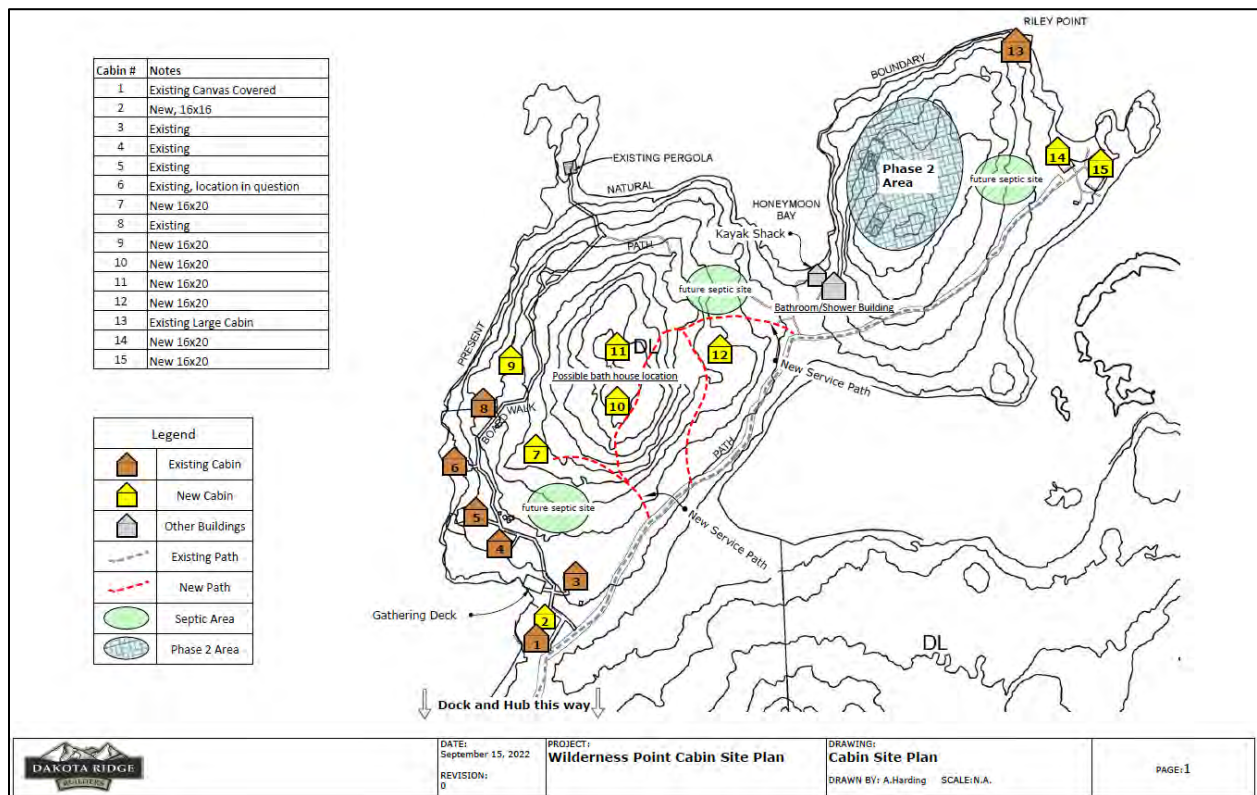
Wilderness Point Cabin Site Plan provided to DHC.
